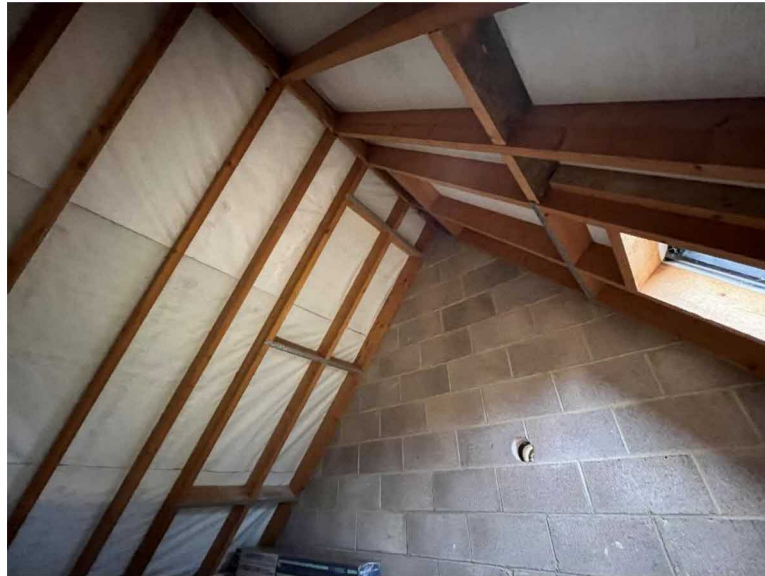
General view of garage interior roof void, note the BRM and 'Velux' window.
